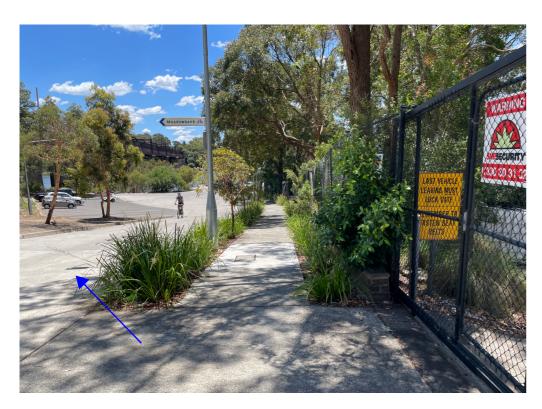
FACING BLAXLAND STREET WEST BOUNDARY OF SITE SHOWING LOCAL HIGH POINT ALONG BOUNDARY
